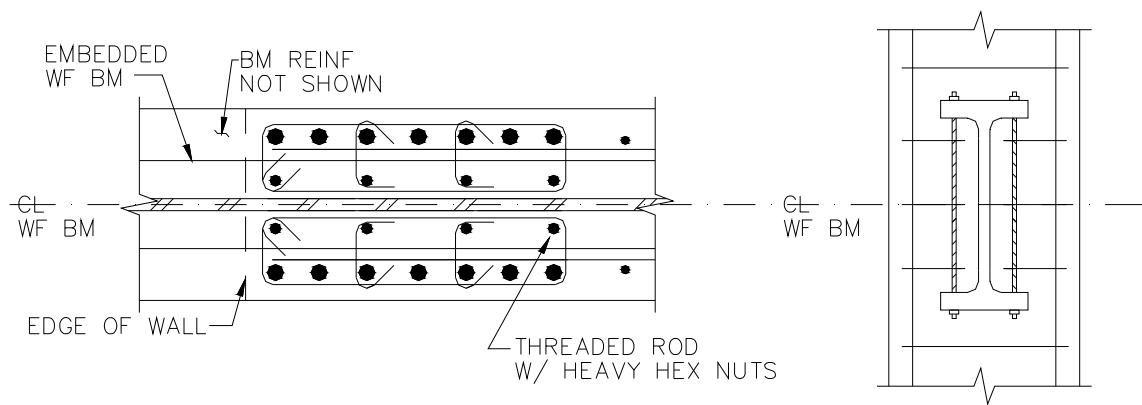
Alternative Embedment Detailing: a) Buckling Restraint of Every Wall Boundary Longitudinal Bar
